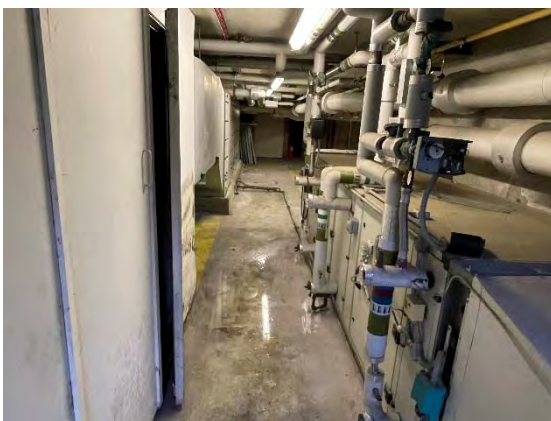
View of basement (plant room) to basement of Hayes Park Central and localised flooding
